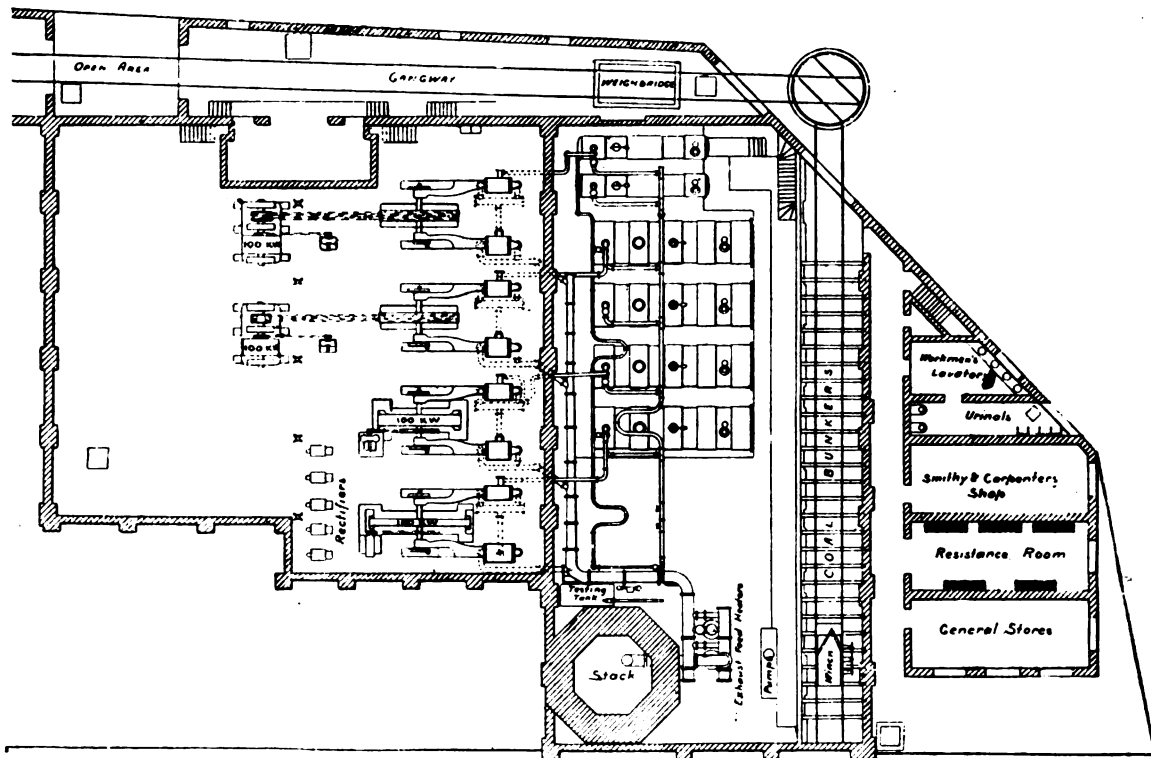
ISLINGTON ELECTRIC LIGHT STATION. PLAN VIEW.
